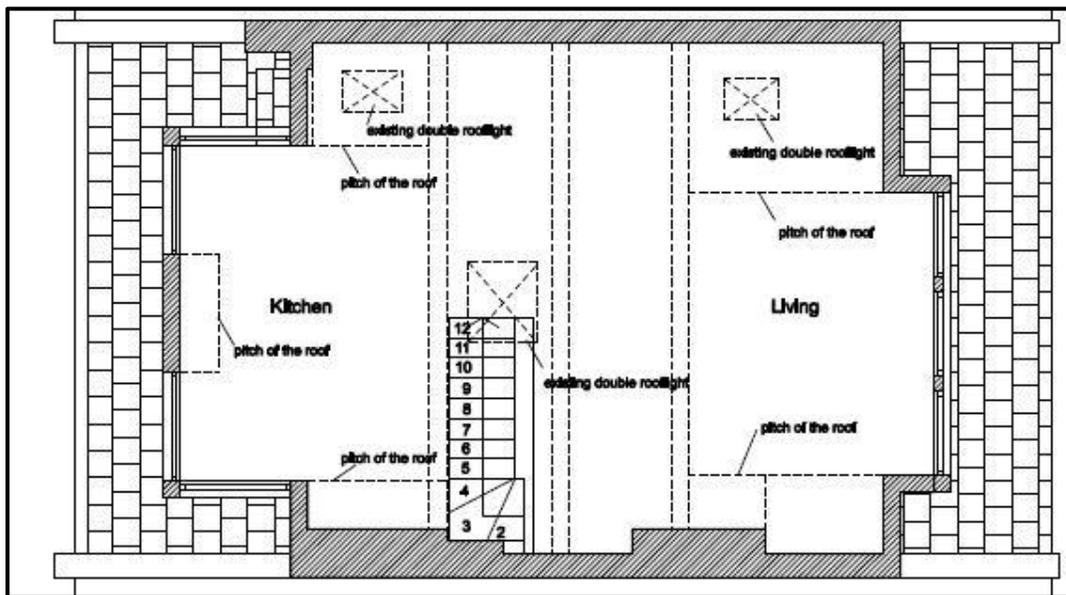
Existing View: Top floor layout 15 Castellain Road
